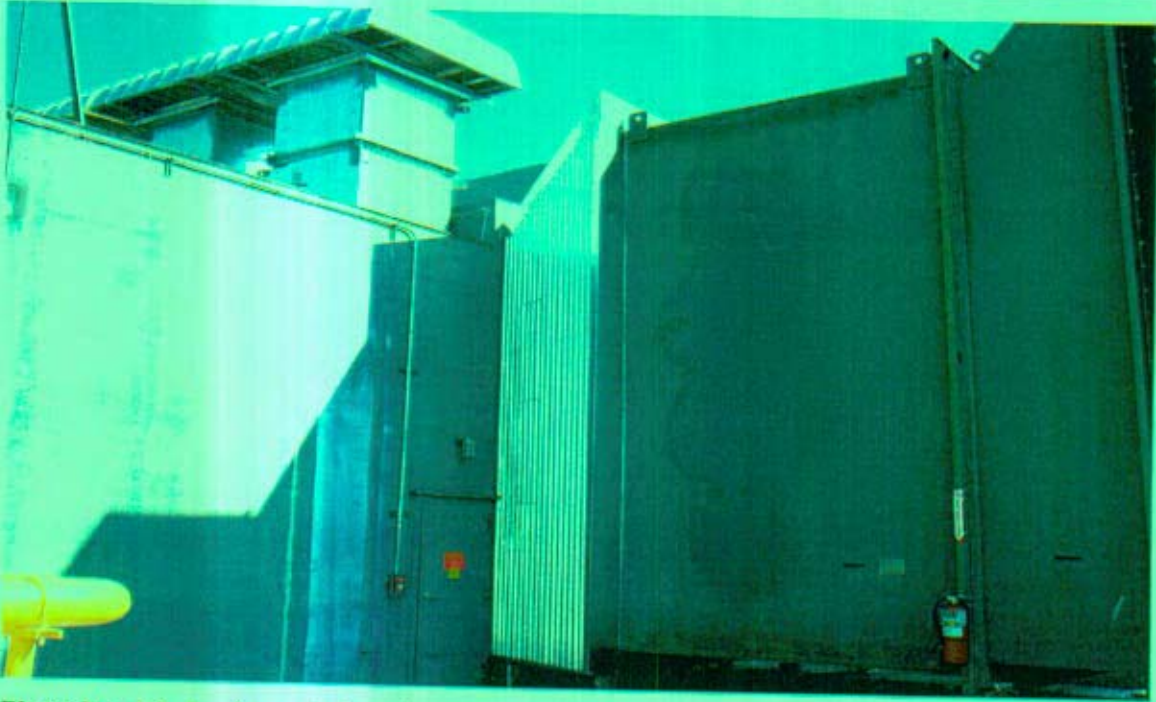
Acoustic Lagging on Air Inlet Transition
